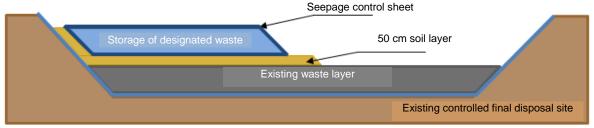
Storage in Controlled Disposal Sites (Example 1)
